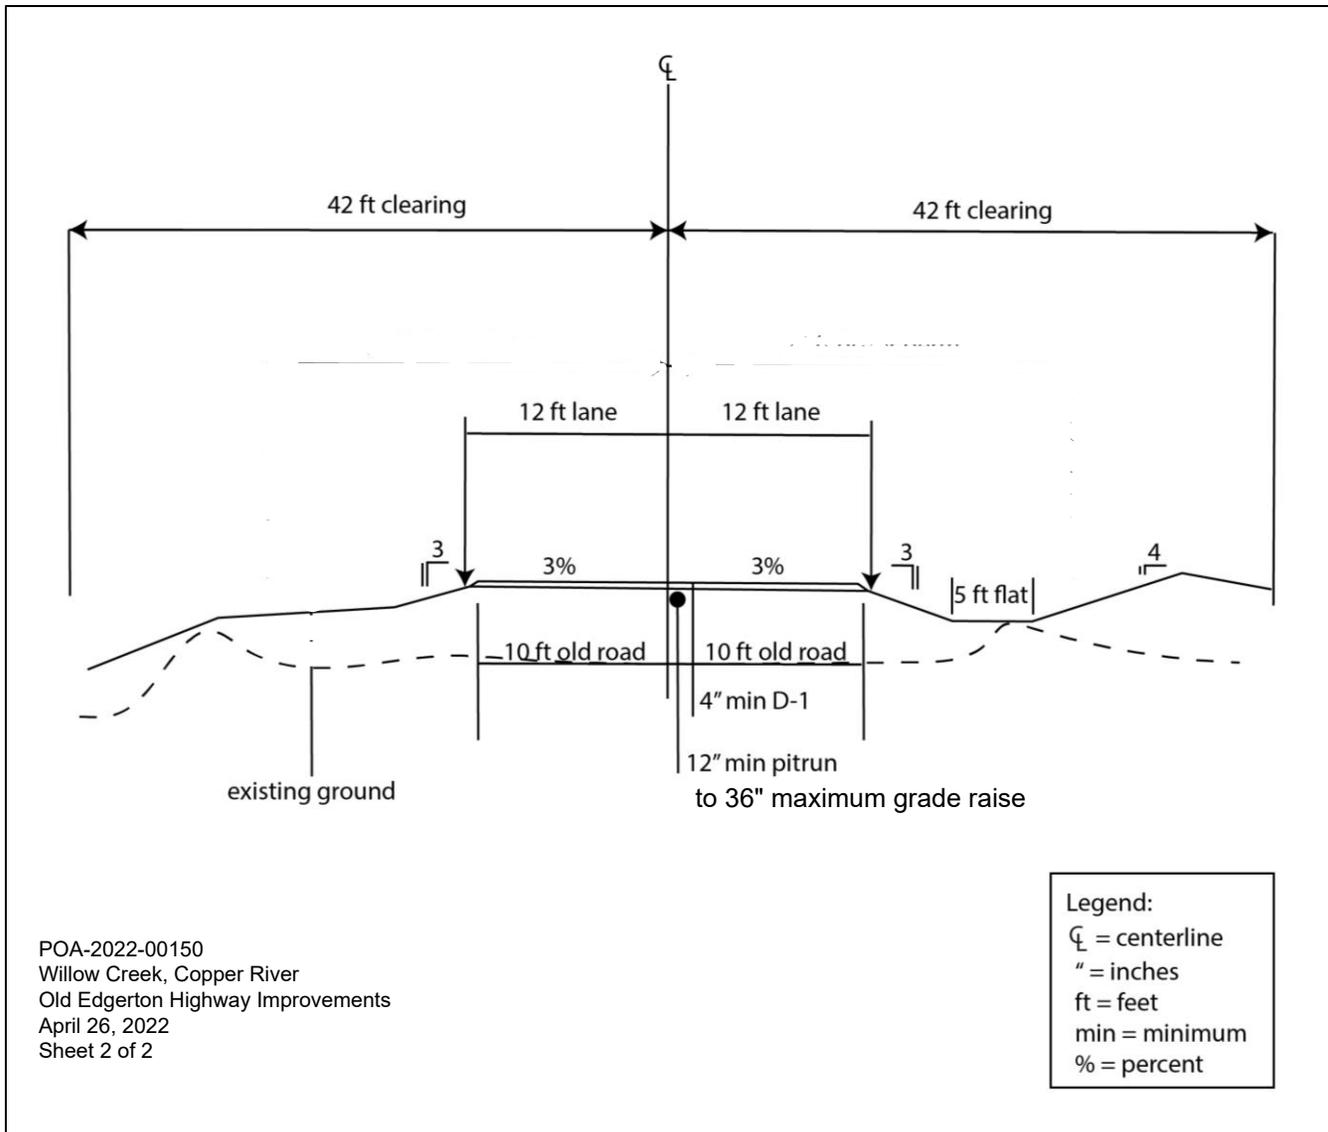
Typical Road Profile Section, Old Edgerton Highway.
